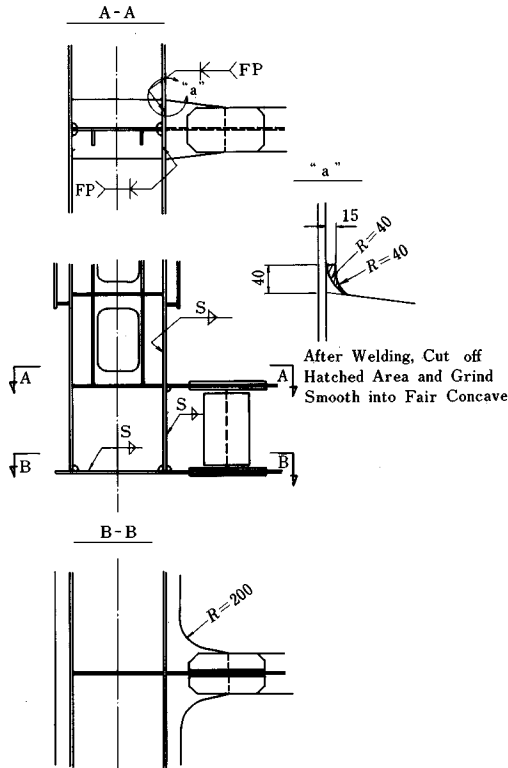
Connection Details of Cross Beam to Main Track Girder.
